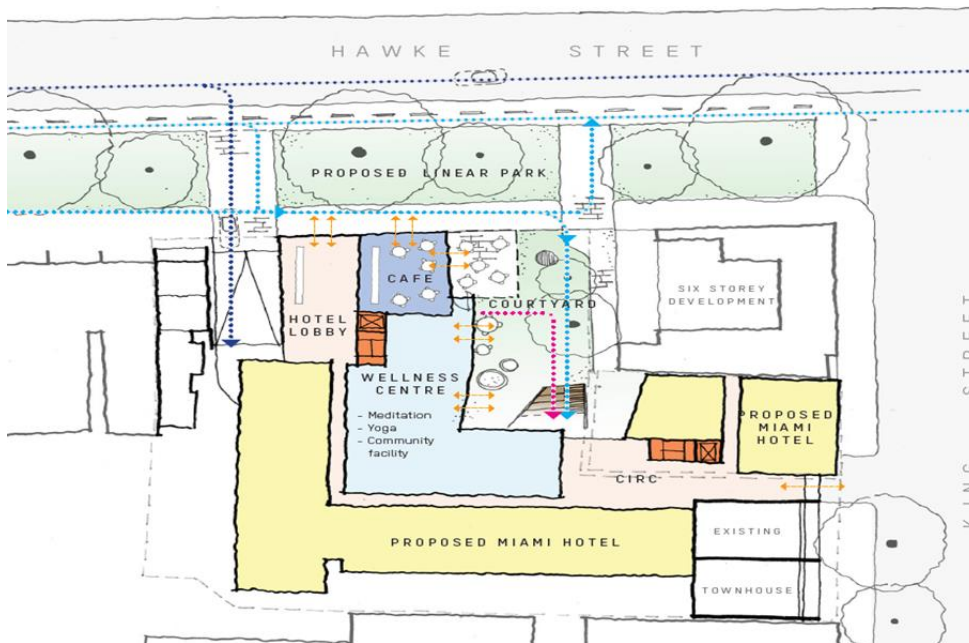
JCB Ground Floor Concept Plan for Miami Redevelopment
